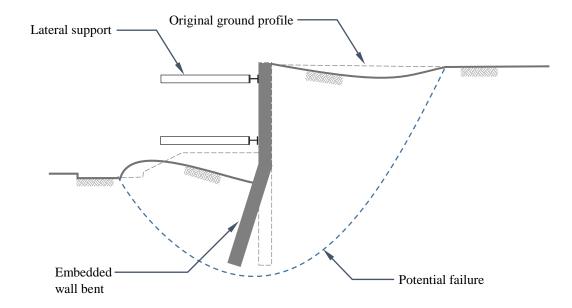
Failure by Toe Instability for a Strutted or Tied-back Wall
